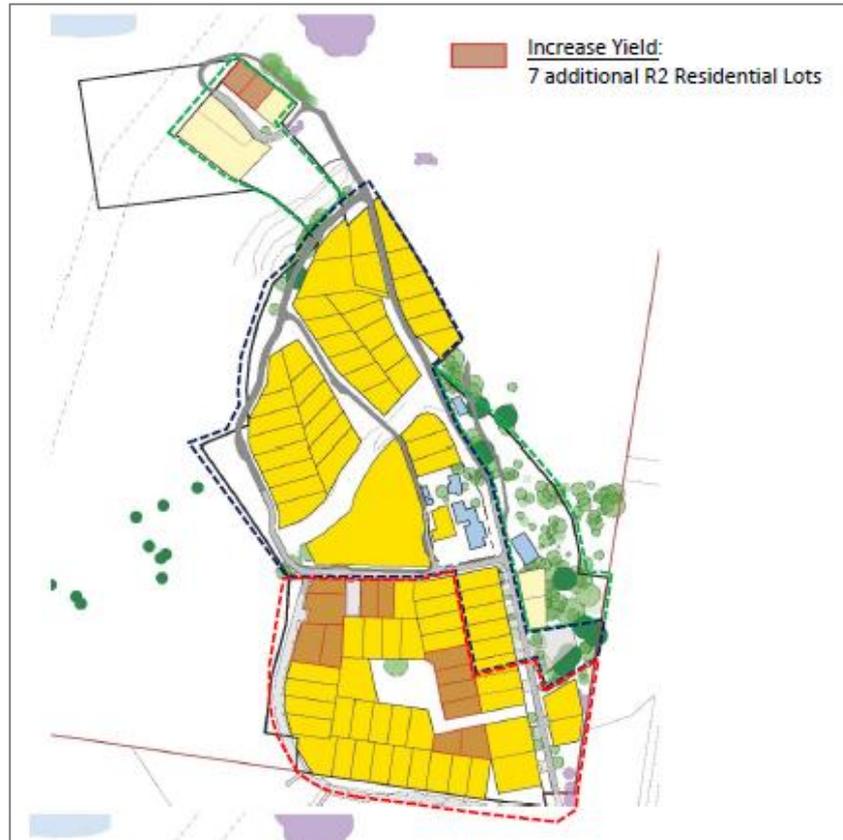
Concept plan identifying lots proposed to be subdivided into 450m²
